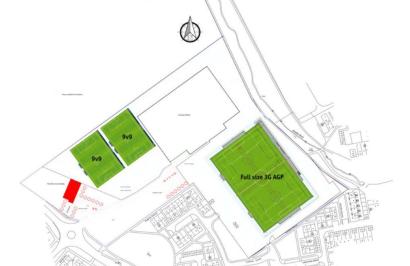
Proposed site layout for Southlands Centre Hub Site
